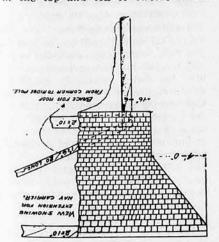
Section of roof, showing extension for hay-carrier track and plan for bracing roof.
